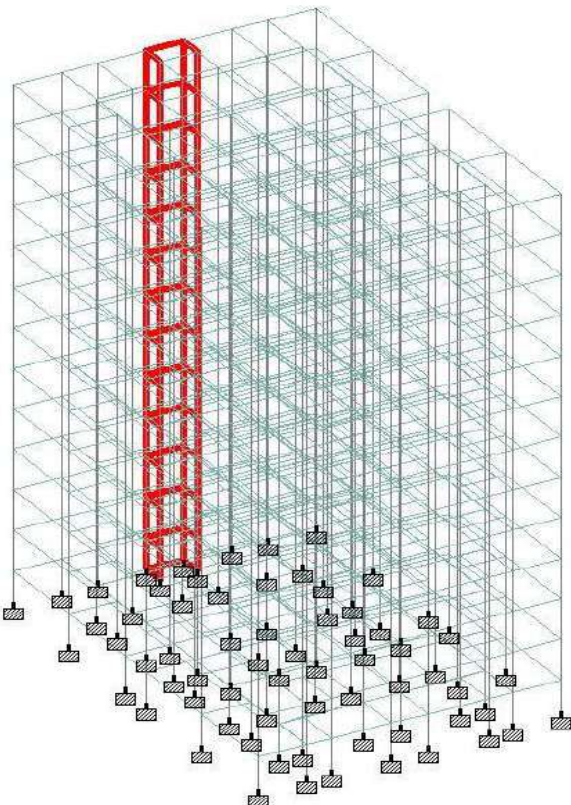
3D Wireframe view of Shear Wall provided at Lift Location
